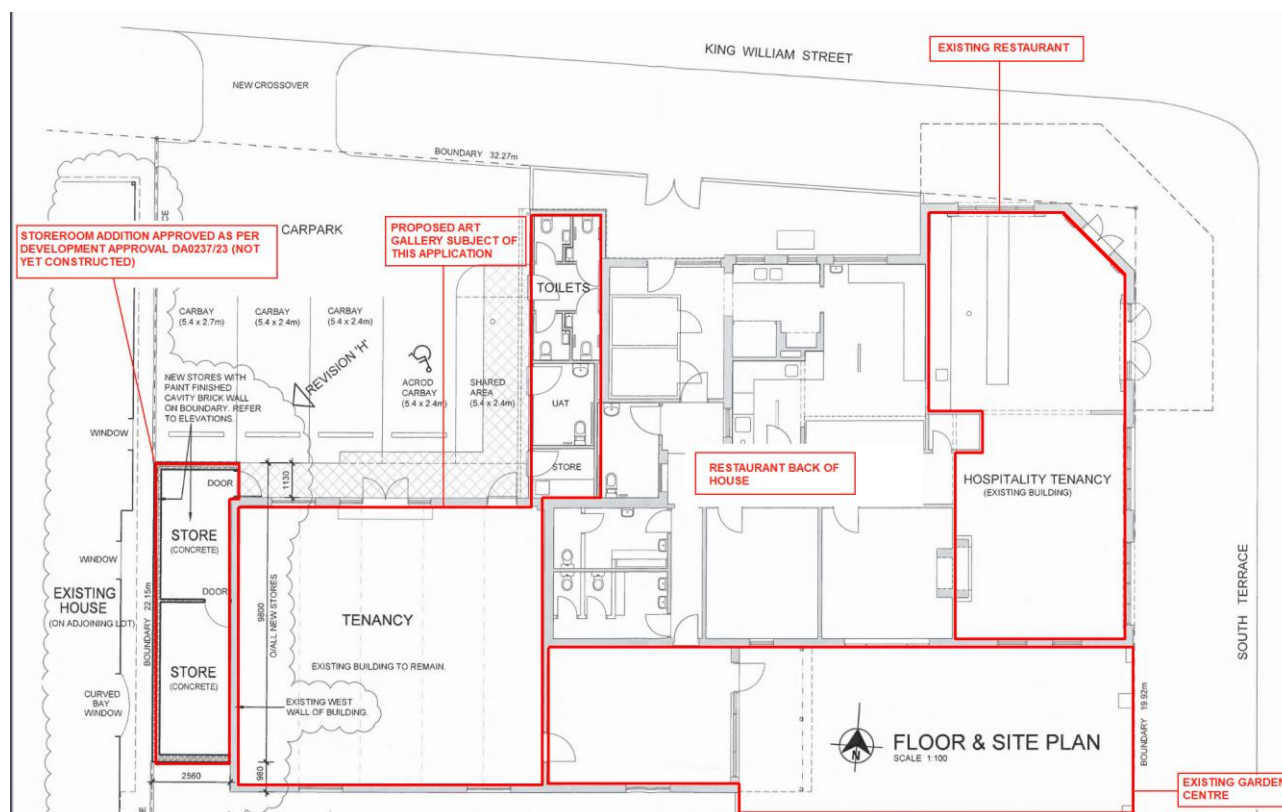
Site Plan illustrating the existing and proposed land uses.
